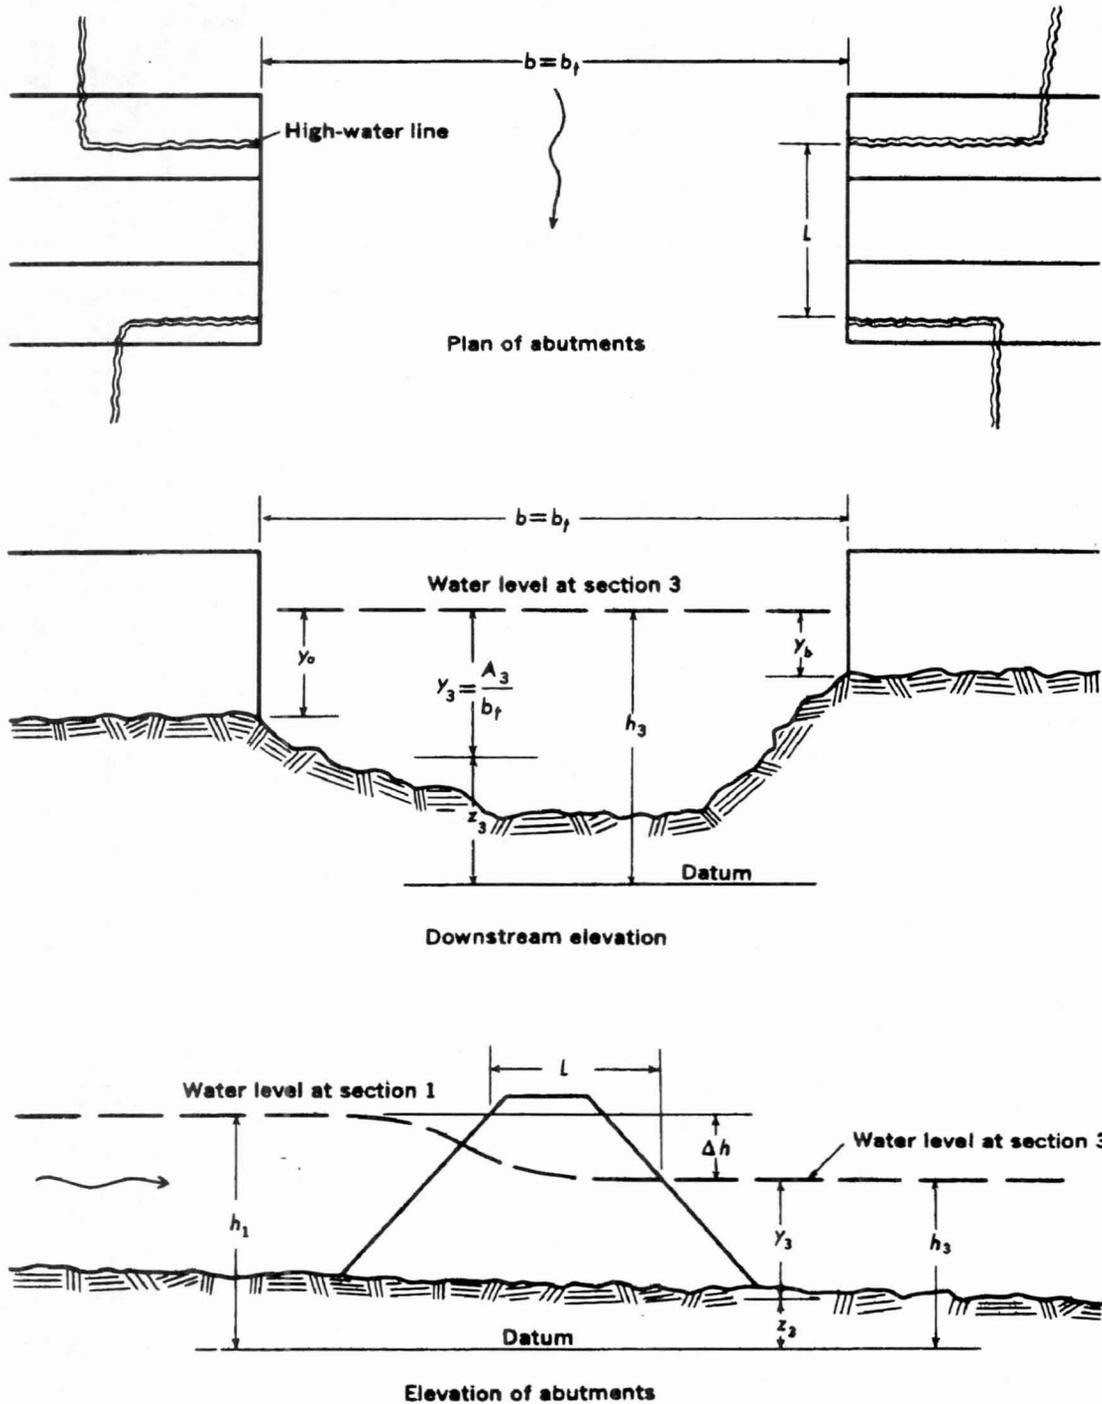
Definition sketch of type 2 opening, sloping embankments without wing walls (after Matthai).
